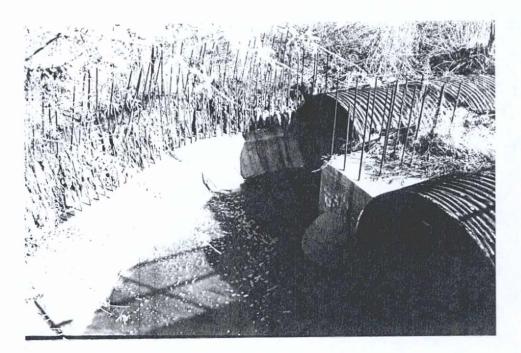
View of stream and storm sewer emptying into culvert under Forest Hill Road looking northeast.
